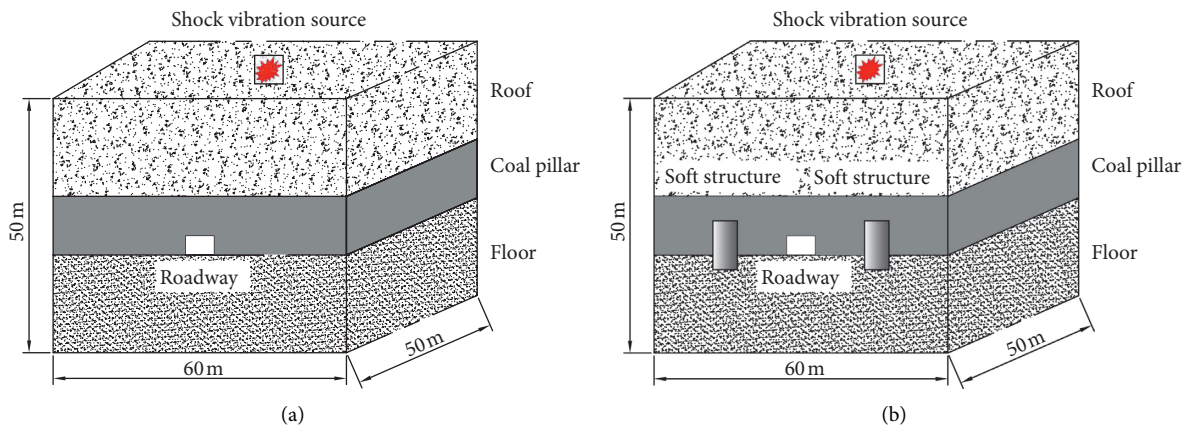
Numerical model. (a) Roadway without a soft structure. (b) Roadway with a soft structure.
